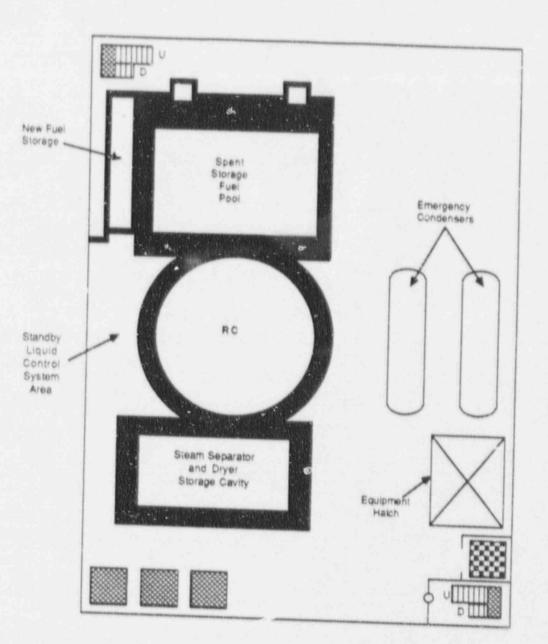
Oyster Creek Reactor Building - Elevation 95'-3"
